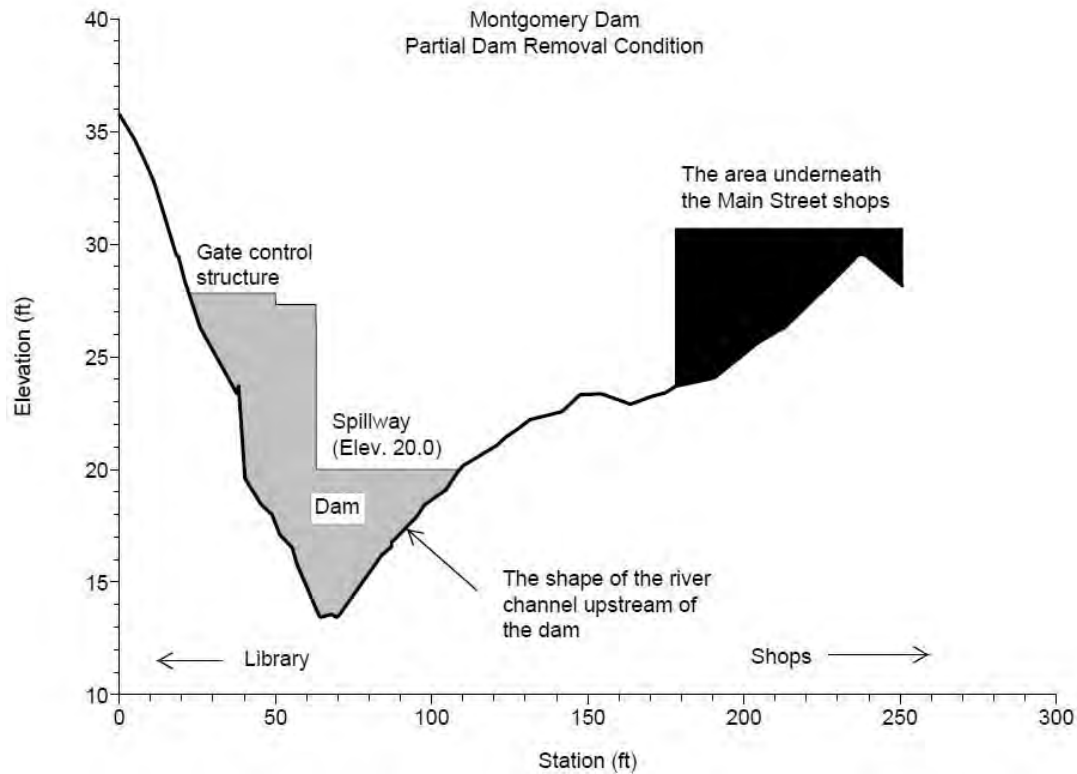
Dam Geometry, Partial Spillway Reconstruction, looking downstream.
